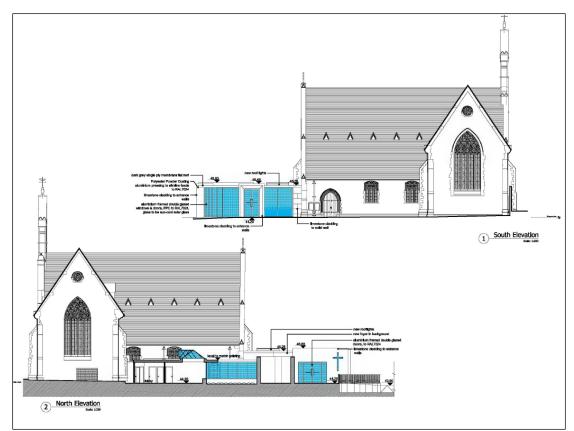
Proposed Elevations (Greyfriars Church, North & South)
